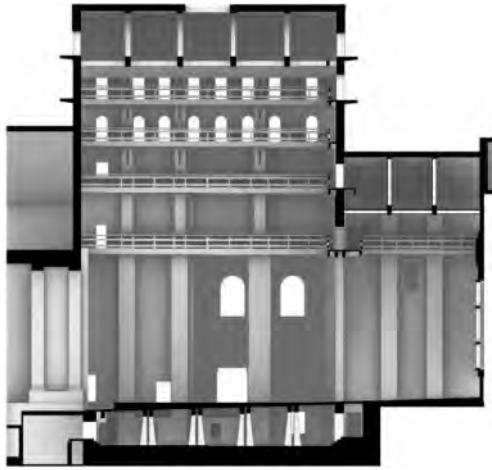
Longitudinal section of the Municipal Theater's stage tower. (© 2020, Beatrice Salmi).
